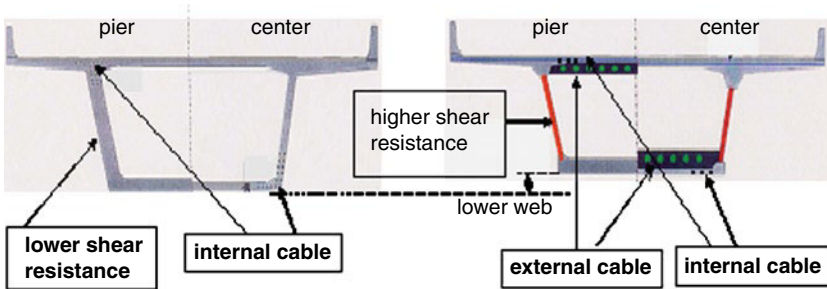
Box girder bridge with concrete web and corrugated web
